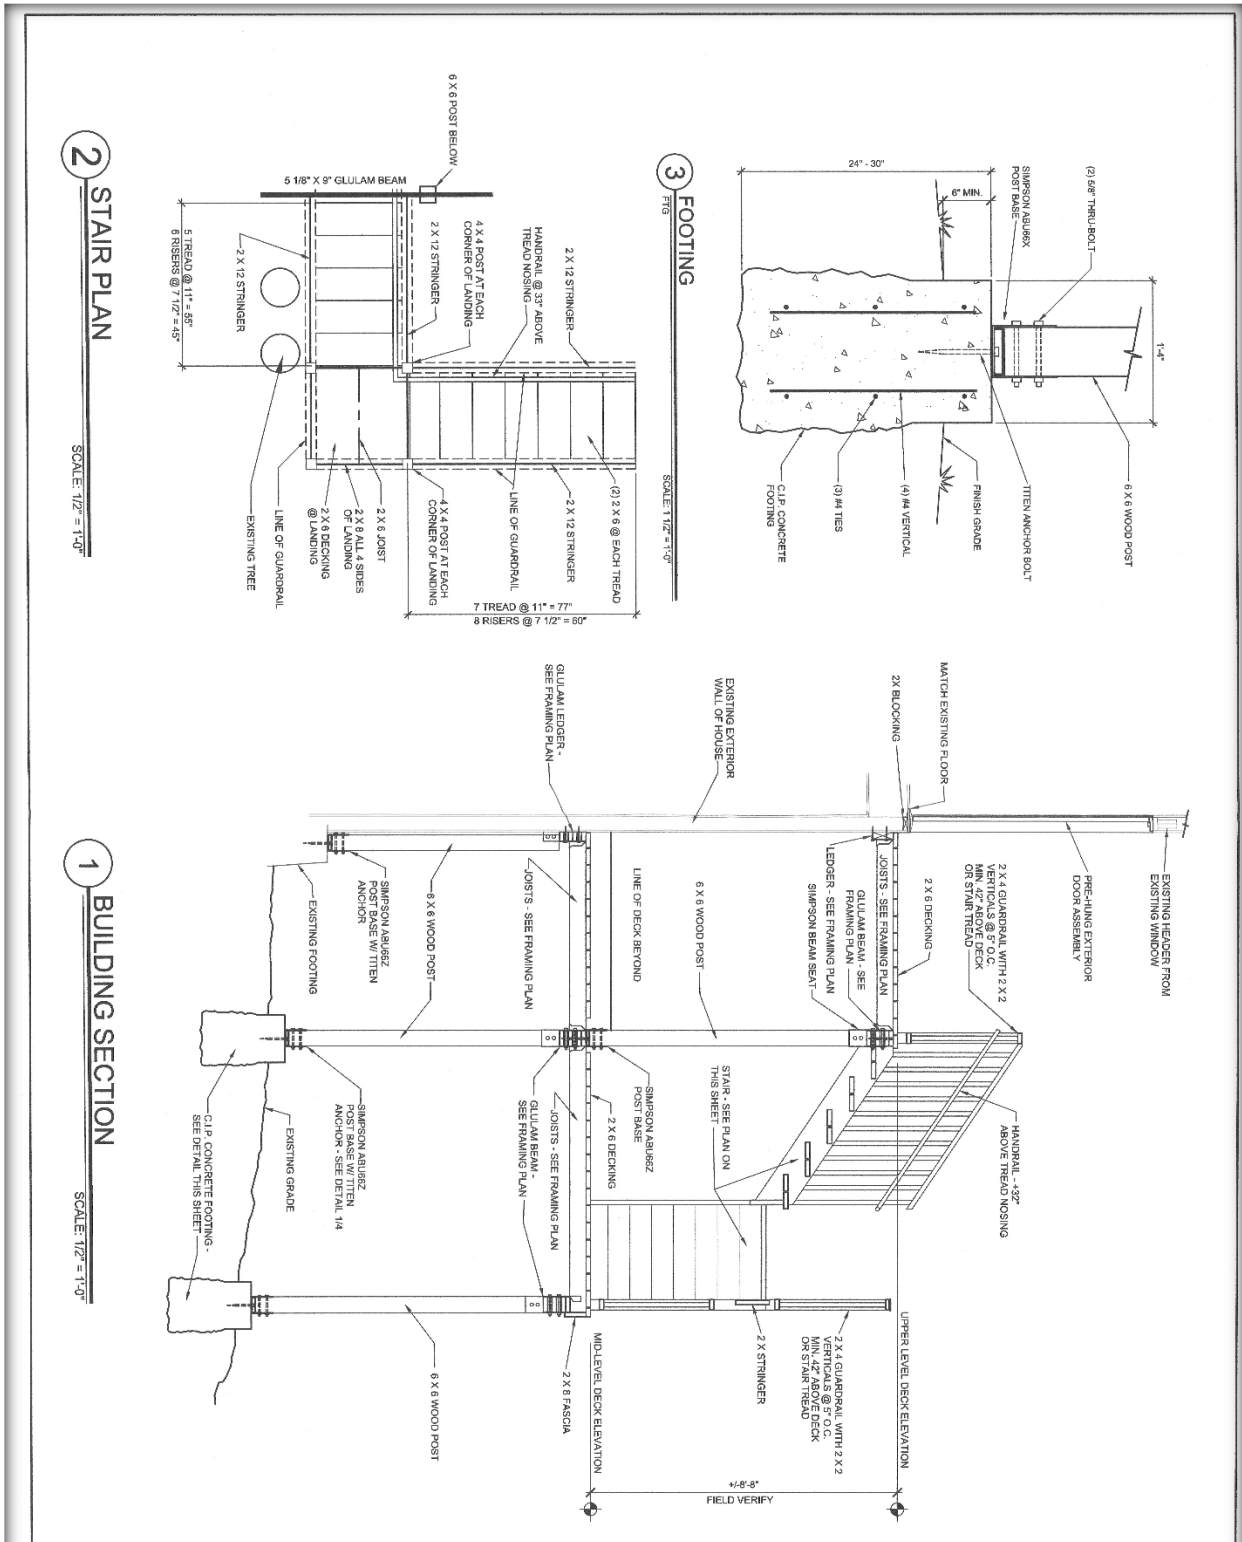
Detail view of page 2, Deck Extension, for the Mid-Level framing plan.
